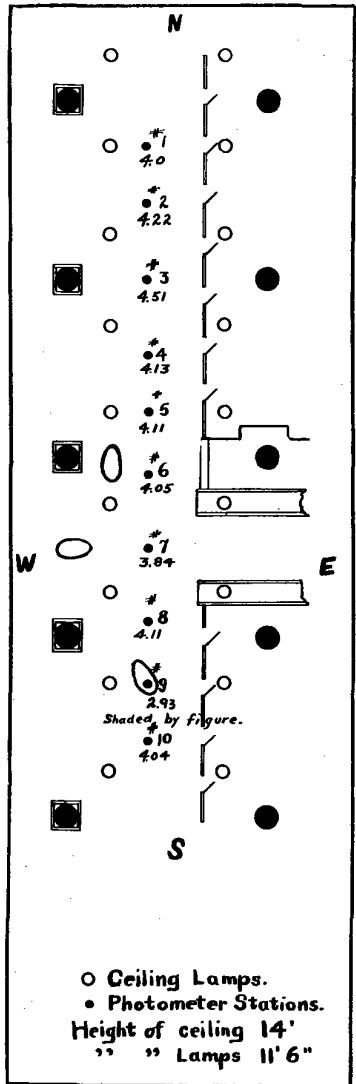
Section of third floor, (ladies' cloak and suit department), showing location of furniture, pillars, lighting units, test stations and illumination data.
